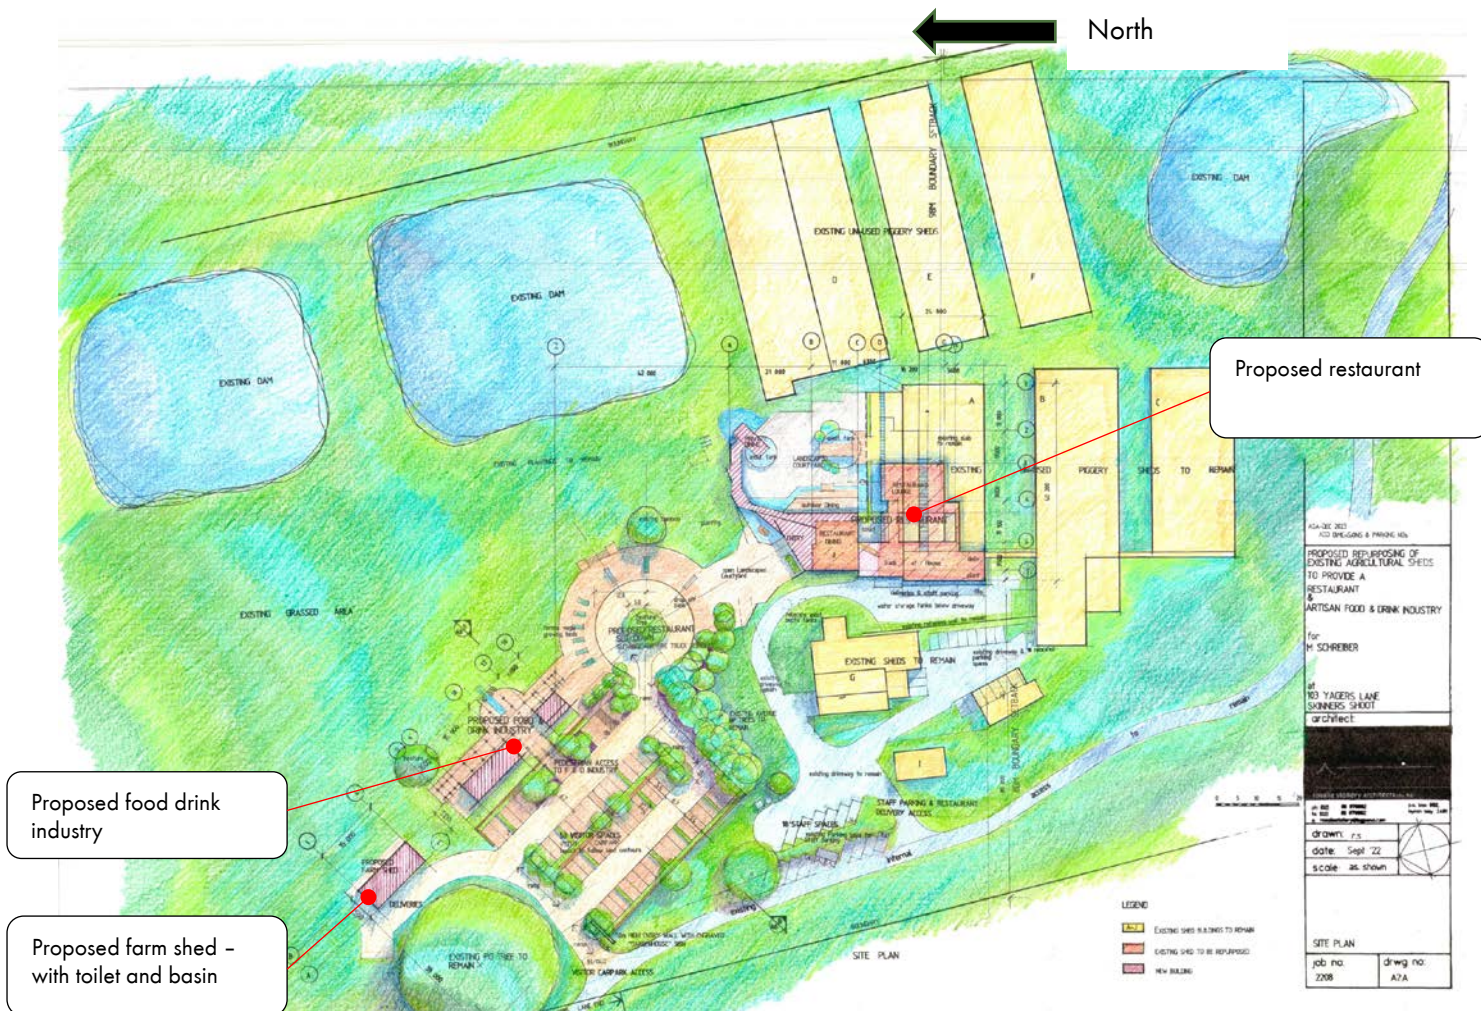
Proposed development (part site plan, Rosie Stollery September 2022)
